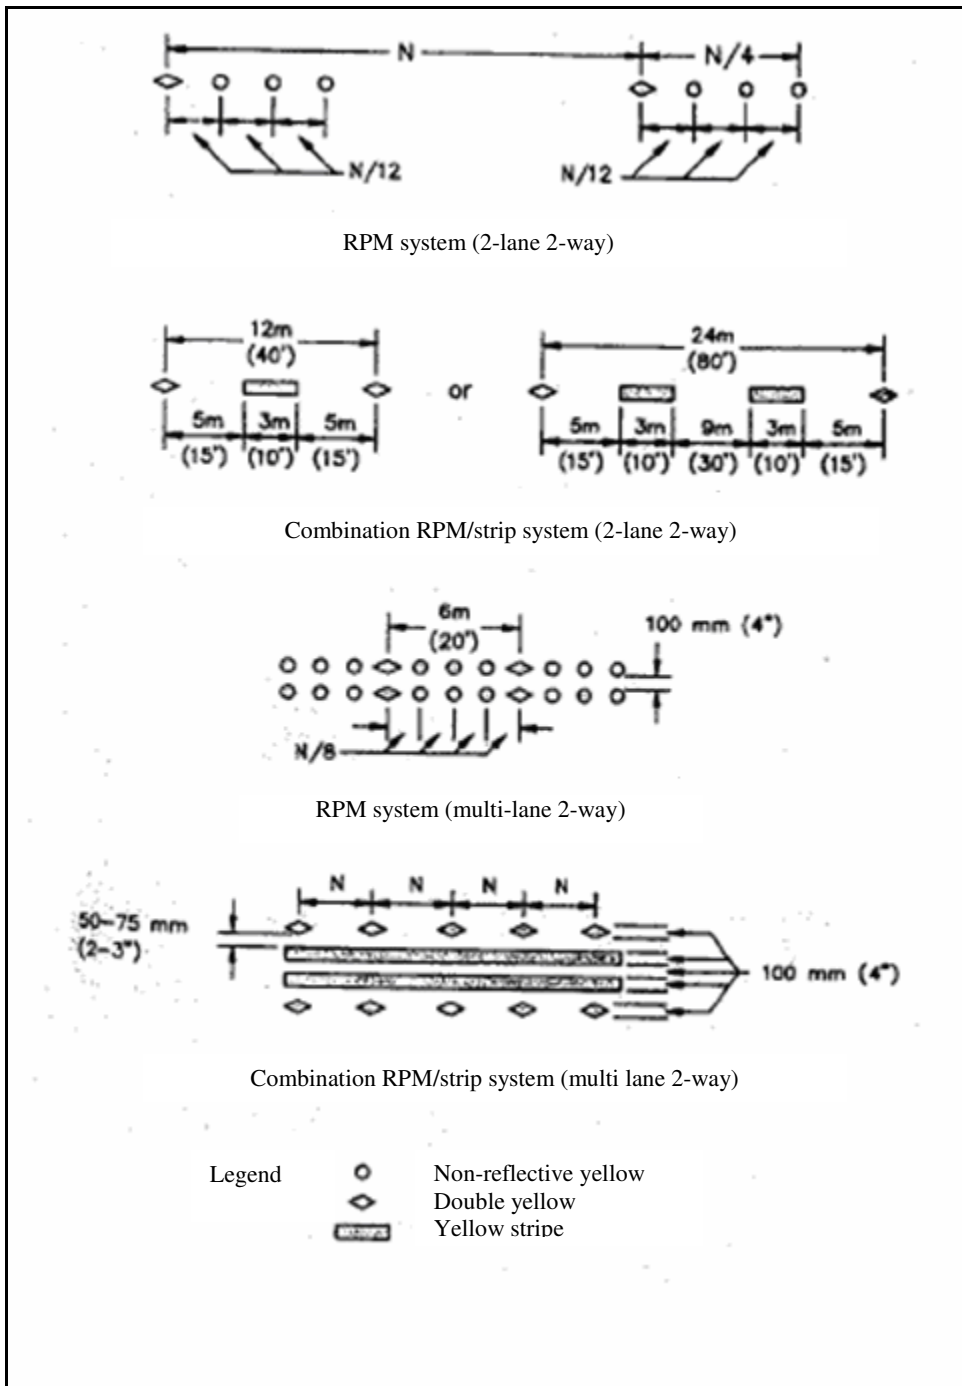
Typical arrangements of RRPMs on tangent sections (8).
